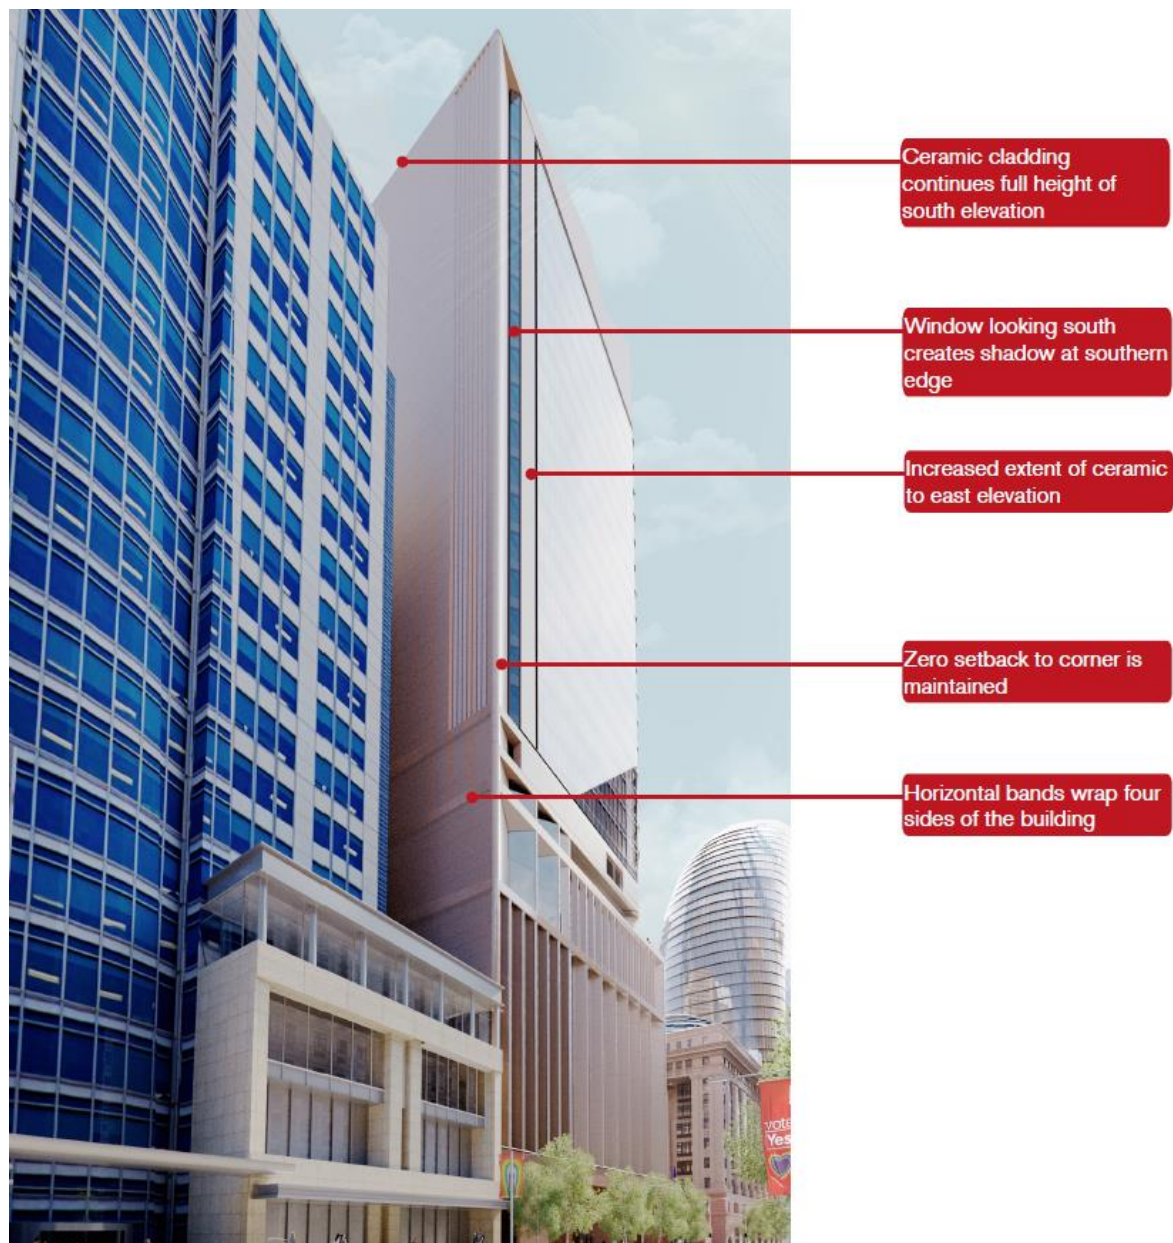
Proposed southern elevation of the building, as viewed from Elizabeth Street
